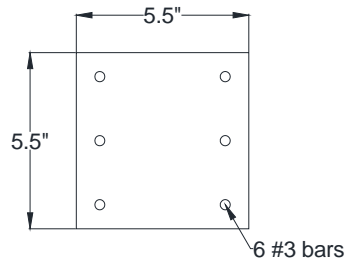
Transverse reinforcement layout for full scale discontinuous frame
